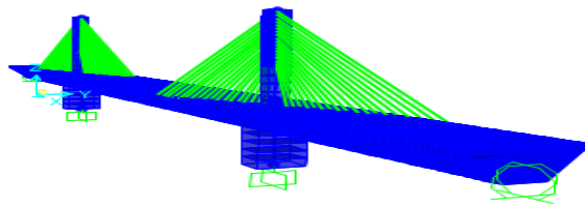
Model of Cable-Stayed Bridge in 3D
